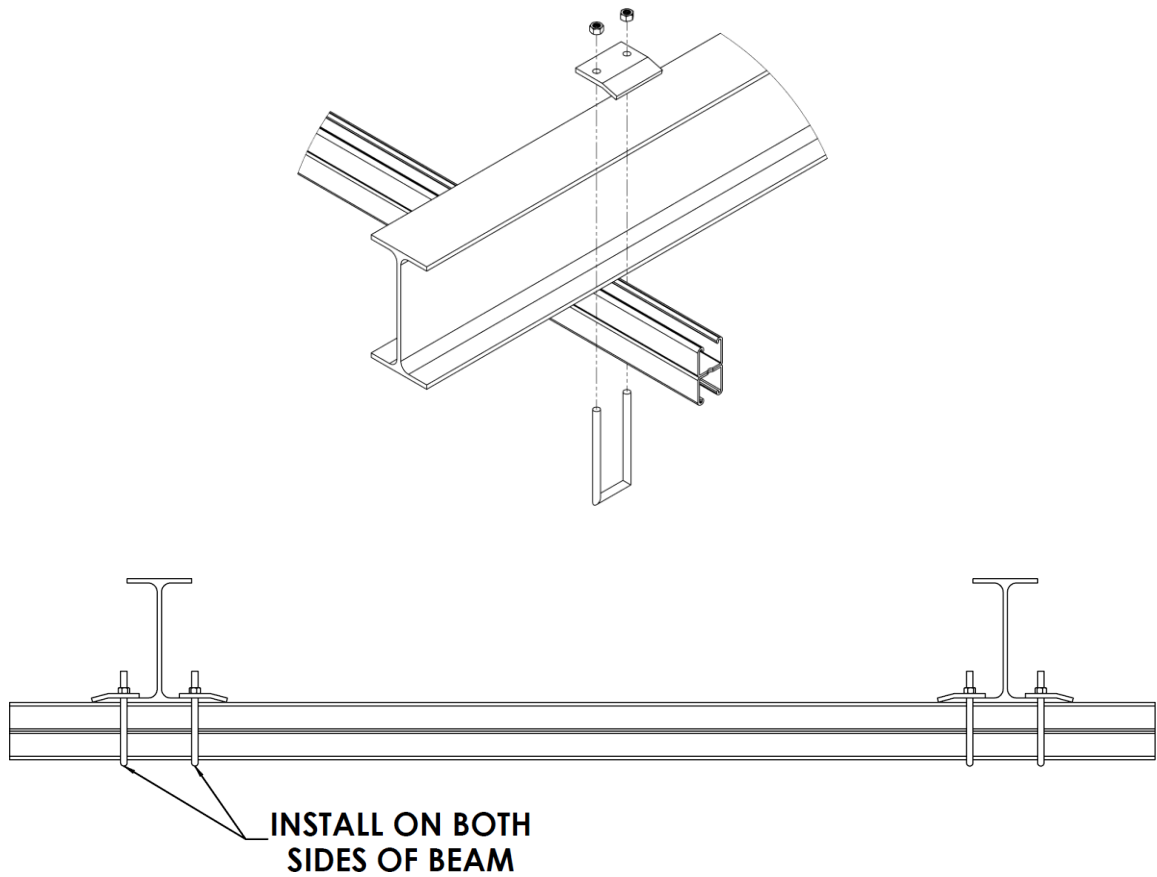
Secure Strut Channel to the Structural Beams Using Four Beam Clamps
